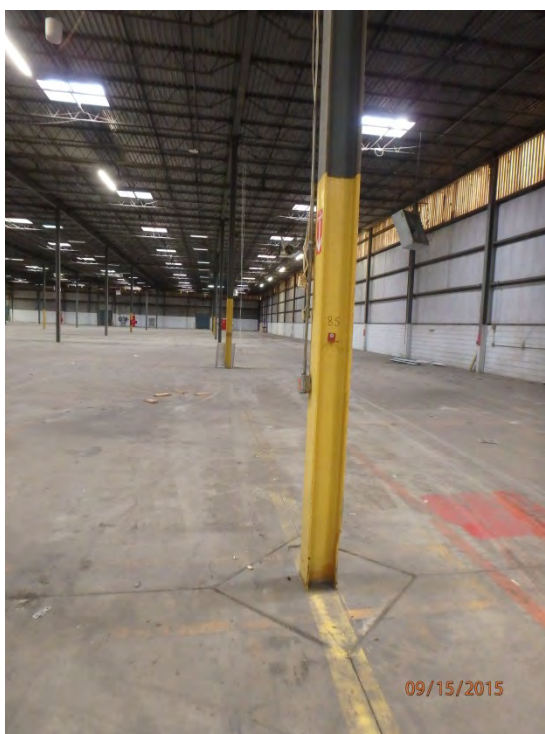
View looking north along eastern wall of the eastern warehouse.
